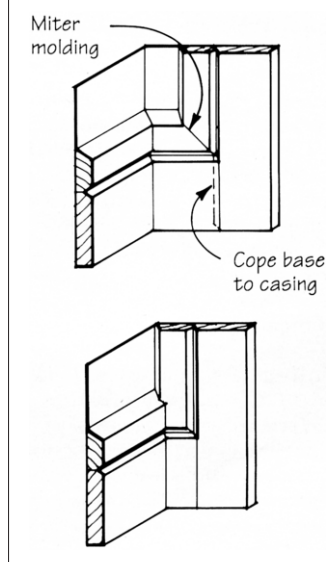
With two-piece moldings, you can achieve more complex profiles and still keep the trim continuous between baseboard and doors (top). However, tight spaces may require tricky joints (above).
